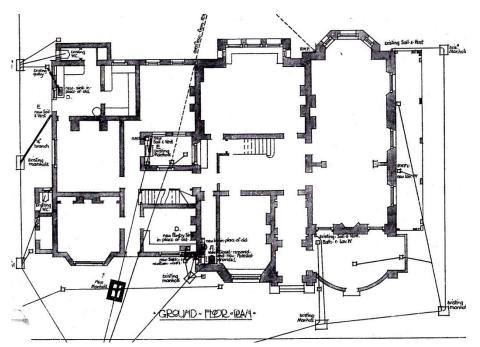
Plan of the ground floor of No. 28 Avenue Road (1905).
